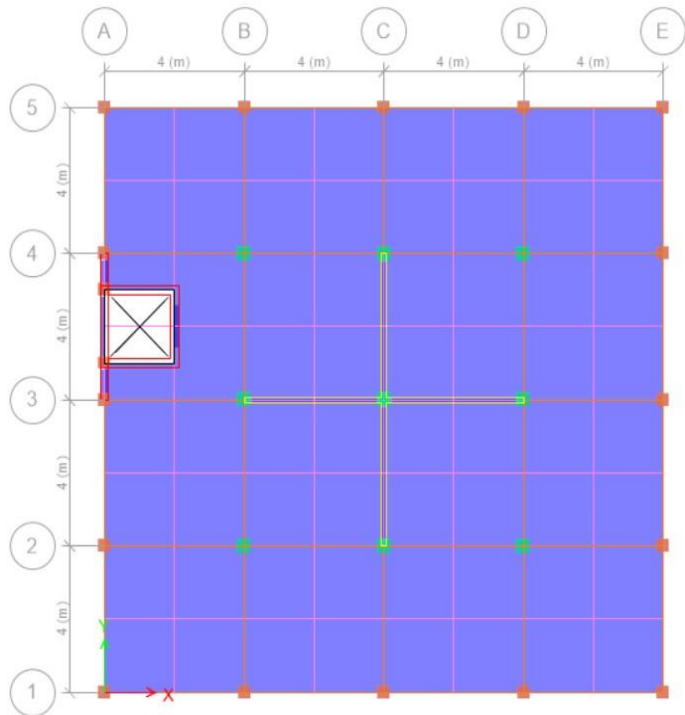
Plan view of RC frame structure with shear wall in '+' shape at centre
